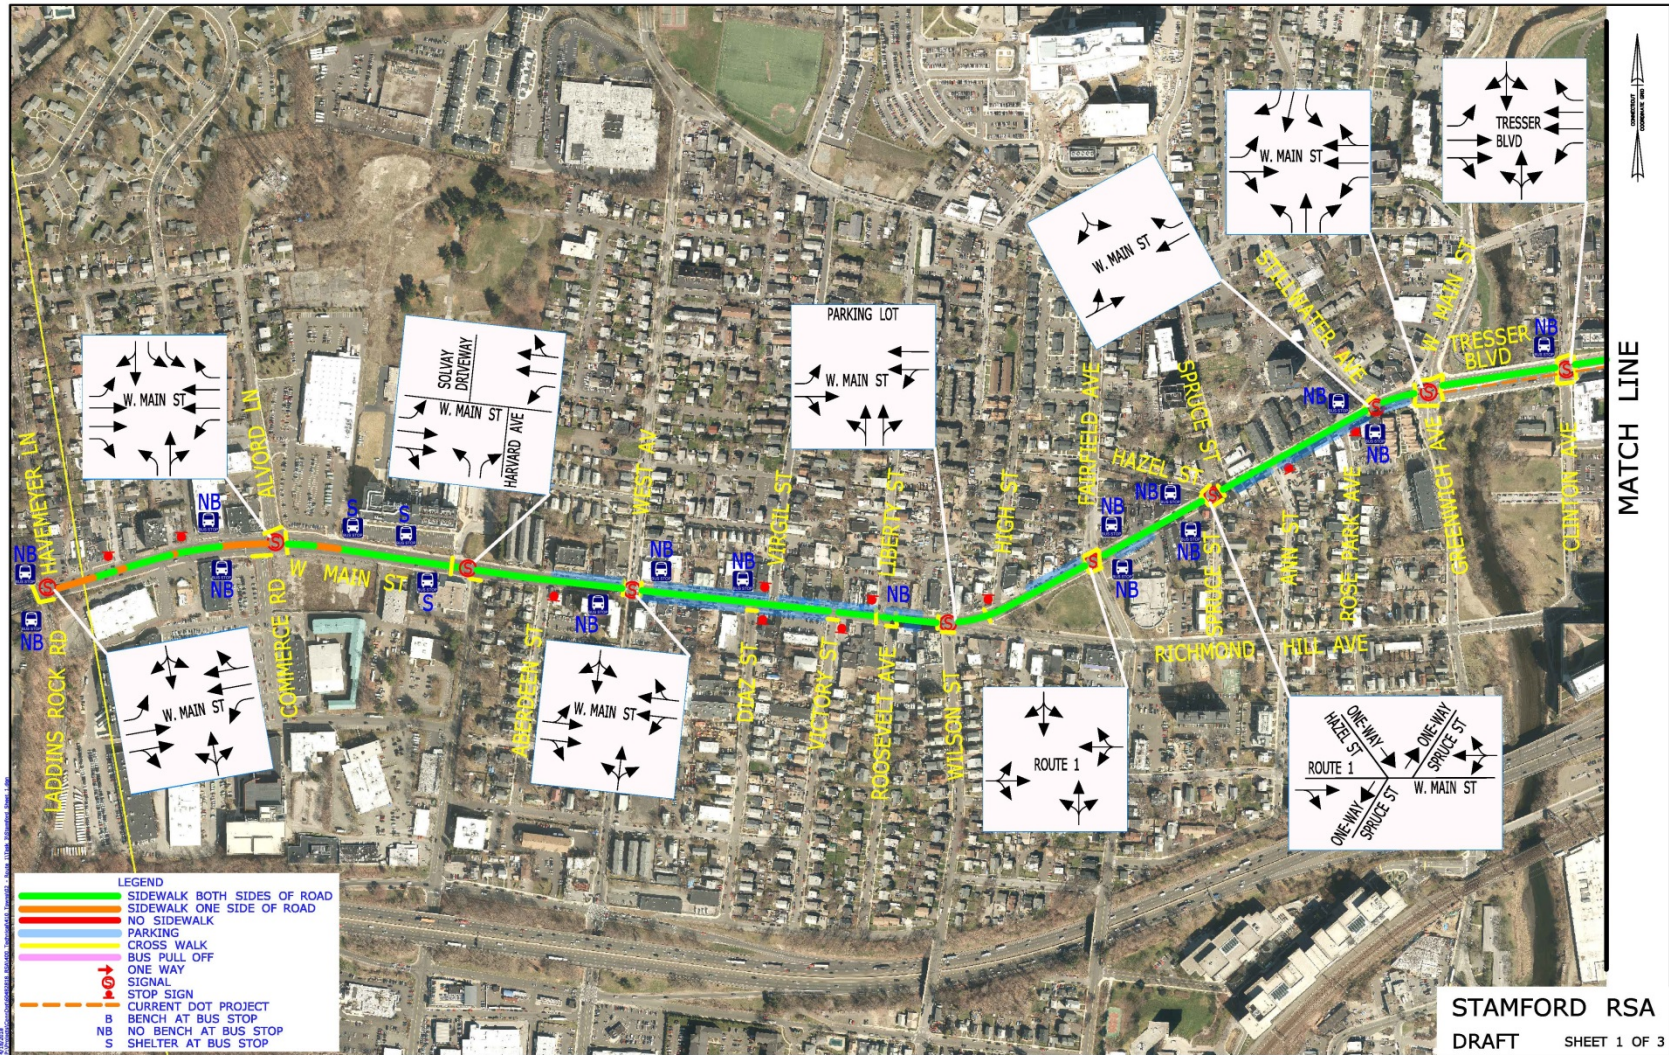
West Main Street to Tresser Blvd., Stamford Route 1 - Road Geometrics
